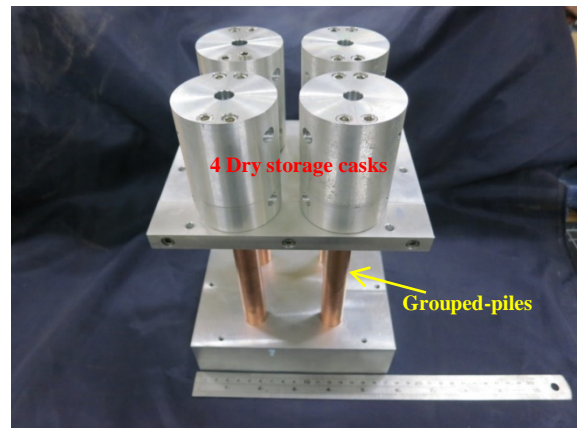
Four model spent fuel storage casks rested on the concrete founded with grouped piles
